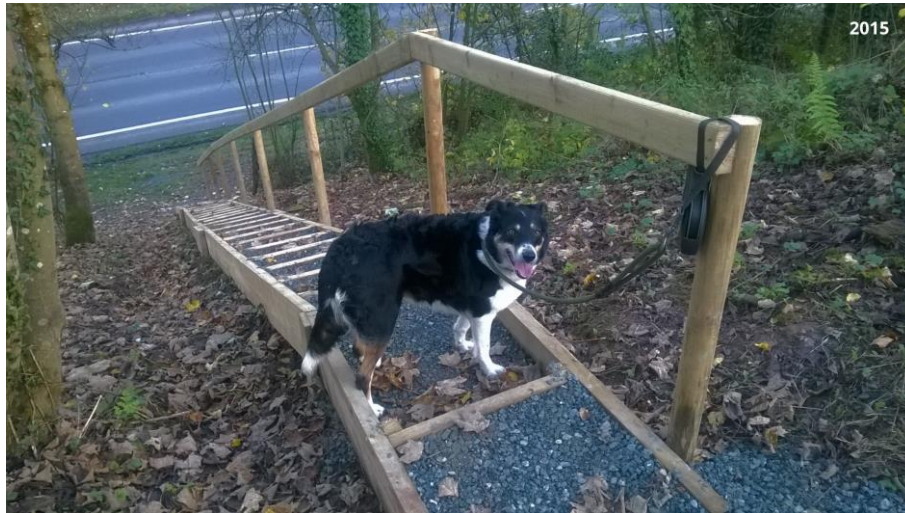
Footpath 23 south of A49 after rebuilding of steps
